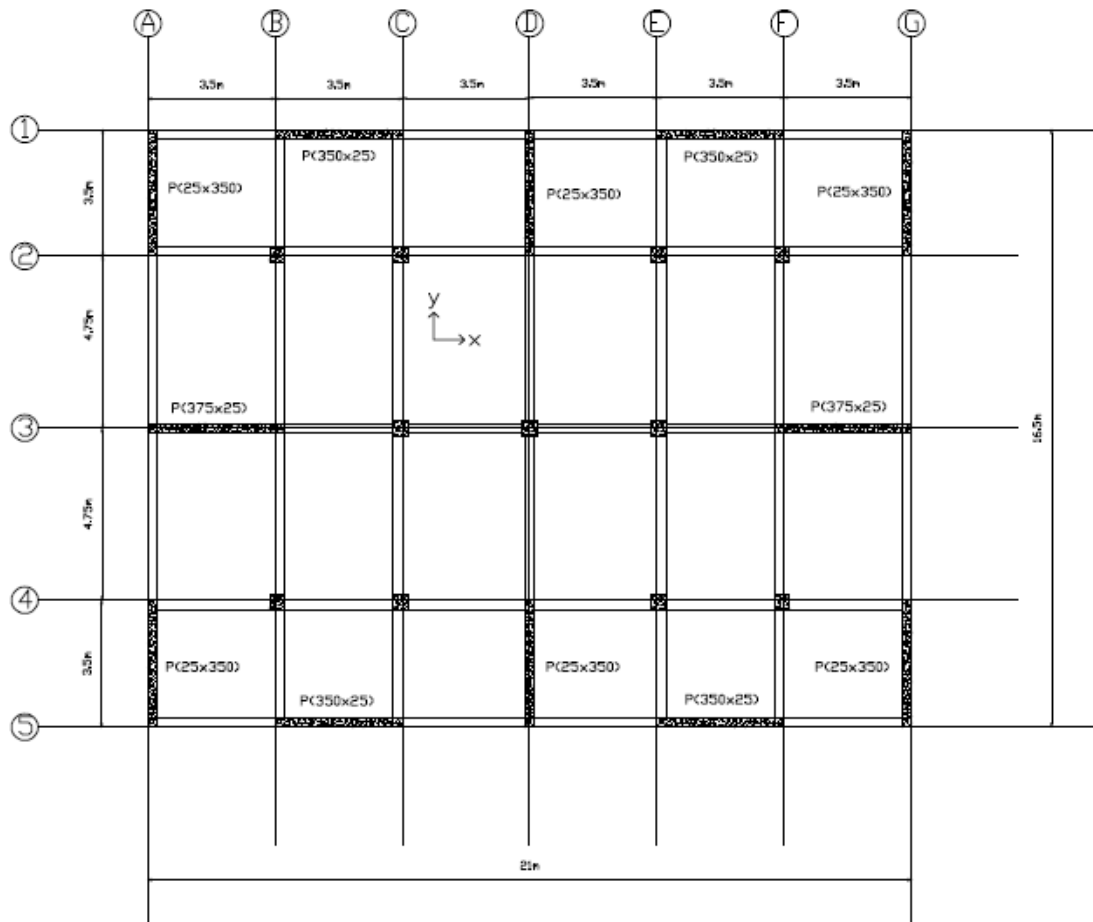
Plan of Model 6 with 1.5% Wall Area to Floor Area Ratio in Each Direction
